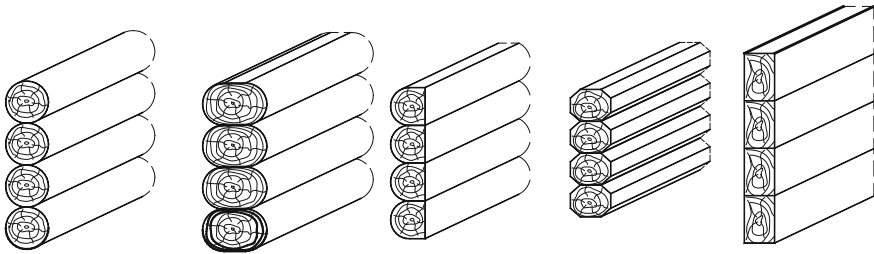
Walls from beams (logs) laid horizontally according to [3]
